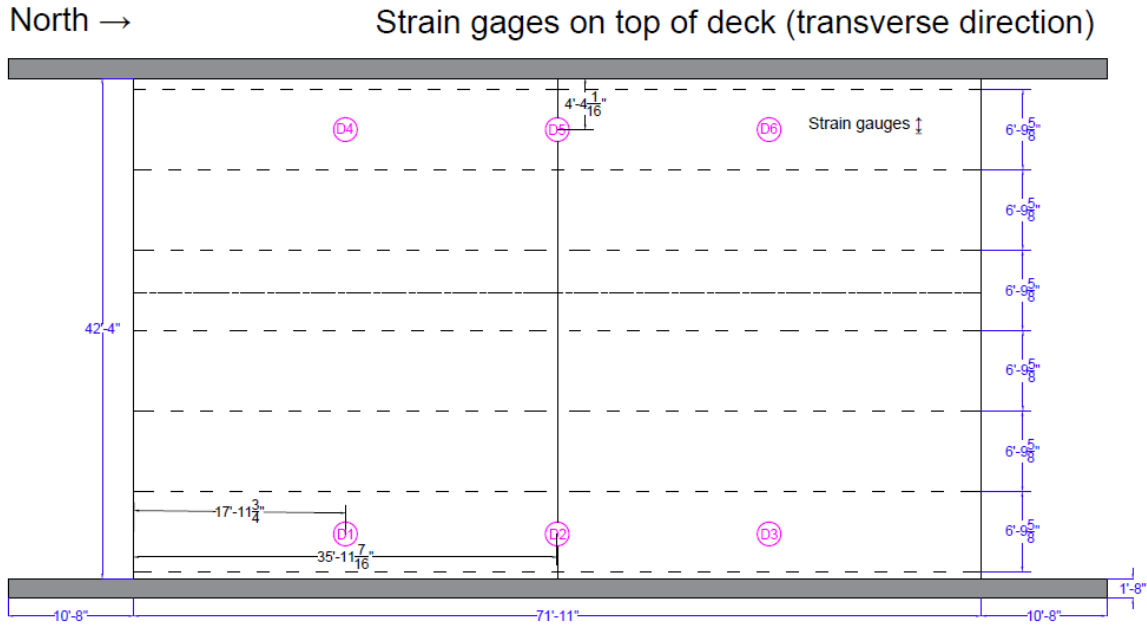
Strain gauge distribution on the top of the deck for live load testing of steel-reinforced bridge deck (27W36)
